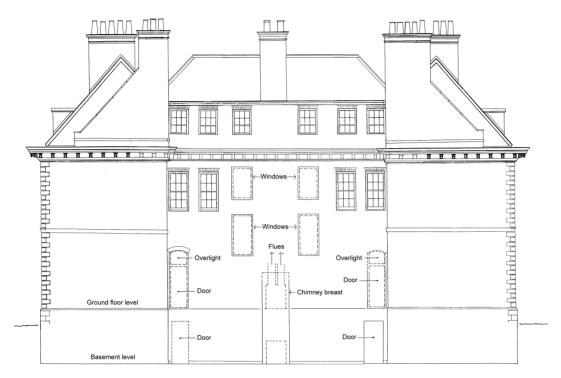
The original arrangement of the north elevation, as reconstructed from the available evidence.
